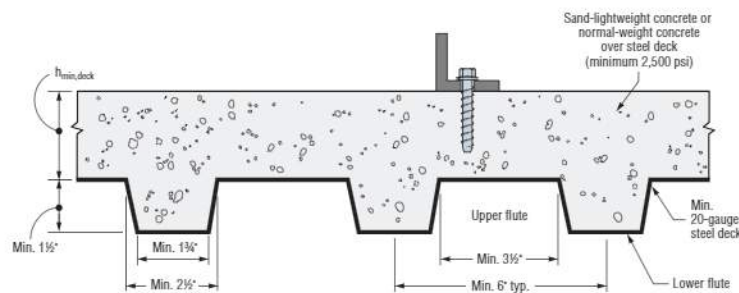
Installation of 1/4"- and 3/8"-Diameter Anchors in the Topside of Concrete over Metal Deck
